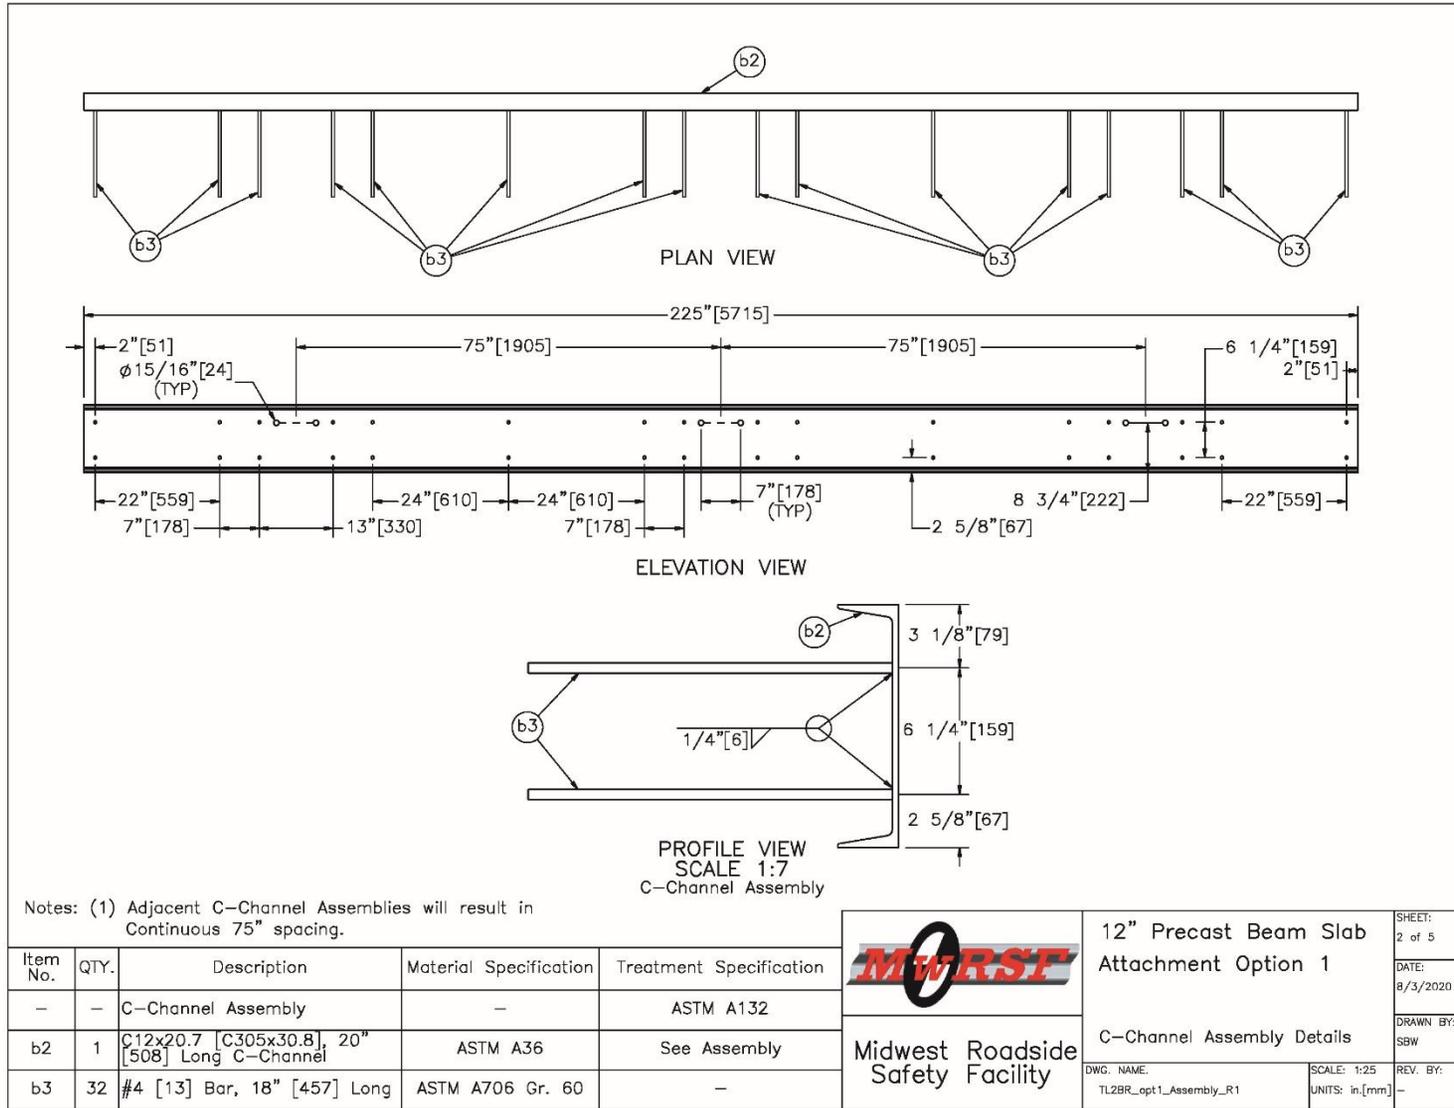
System Details, TL-2 Bridge Rail Attachment to 12-in. Deck, Option 1, Channel Assembly
